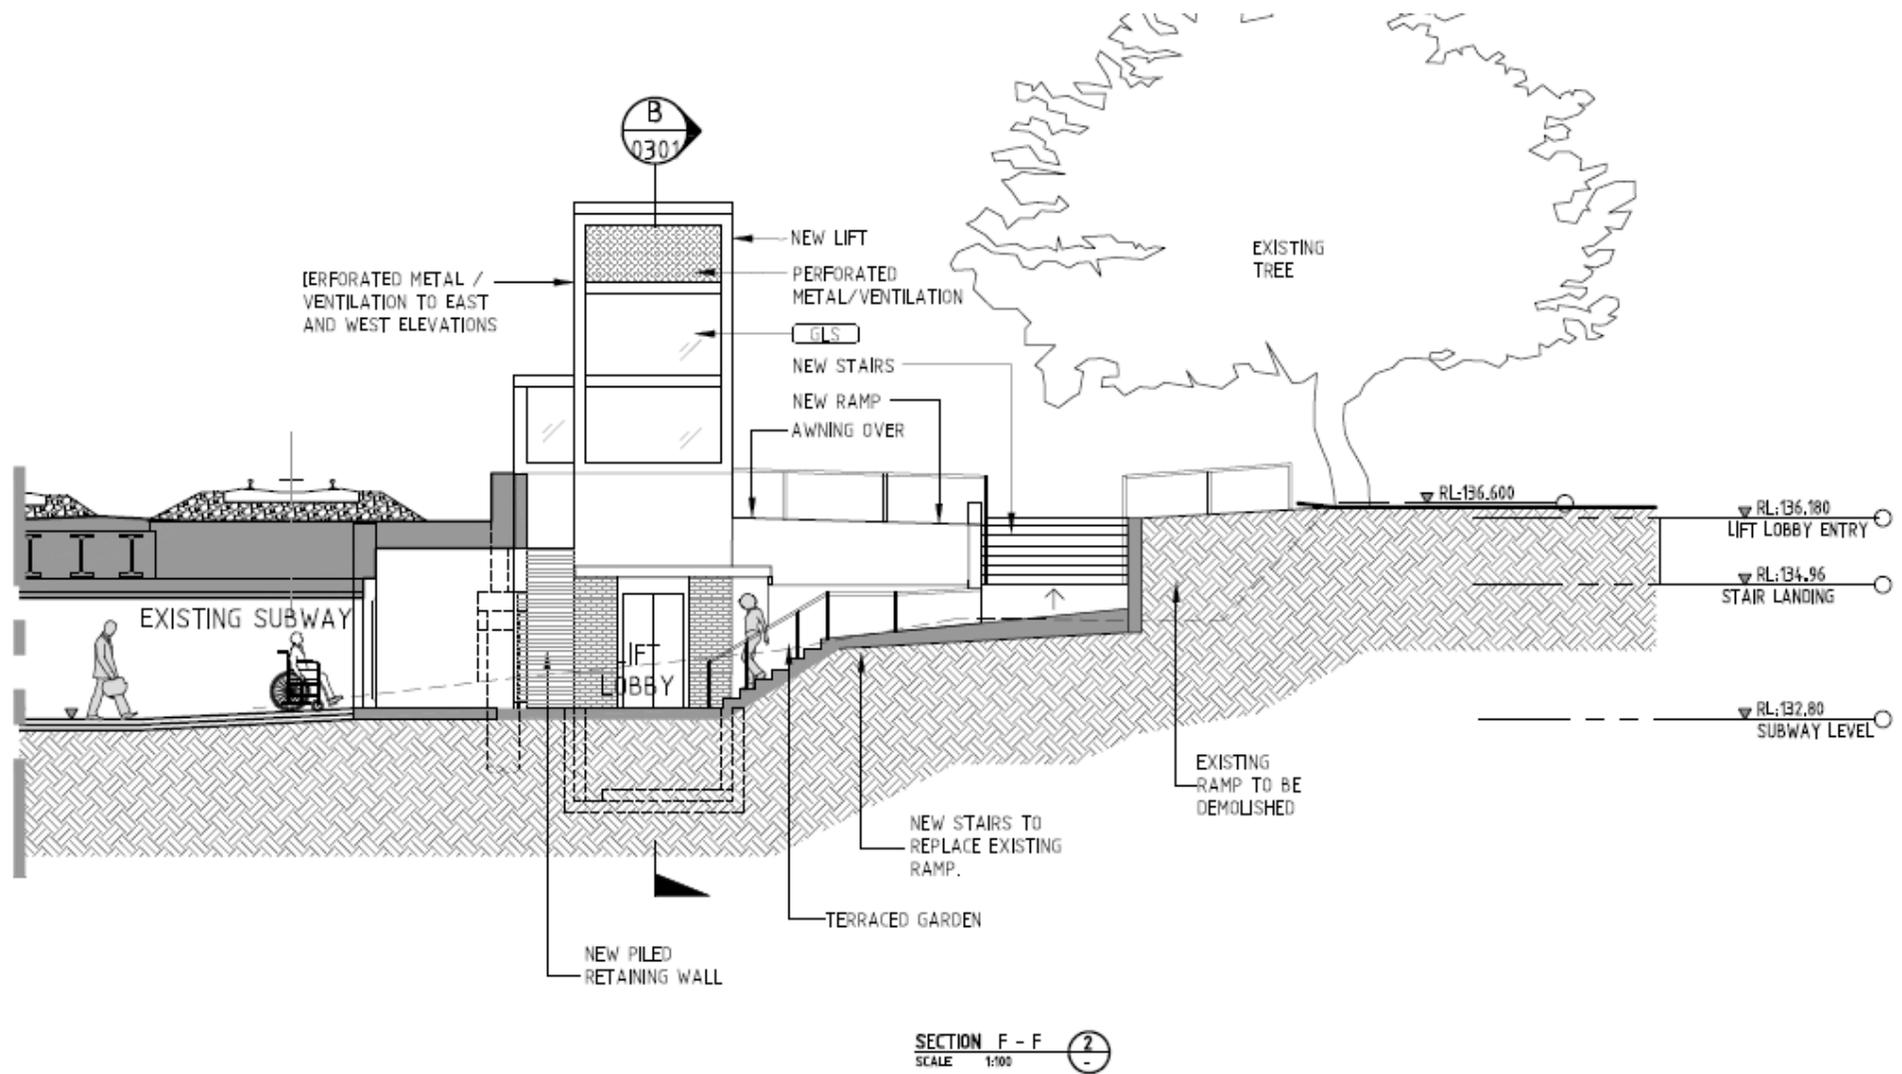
Beecroft Railway Station – Proposed Works – Proposed Lift Tower to Western Access Pathway – Section (facing South) (Source: CCG Architects)
